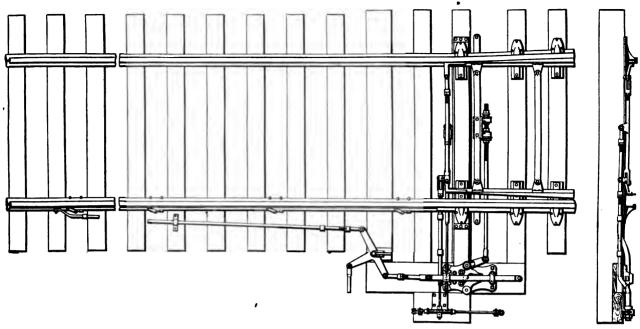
Outside Connected Facing Point Lock and Switch Connections, with Bolt Lock. Two Detector
